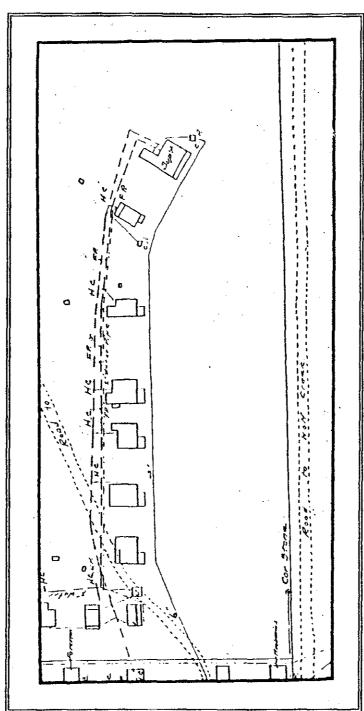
Portion of map reproduced on February 8, 1916 from Stone and Webster drawing. House No. 1 is the building at the far left labeled "Sup't." (MPC Drawing No. 17304-E)
